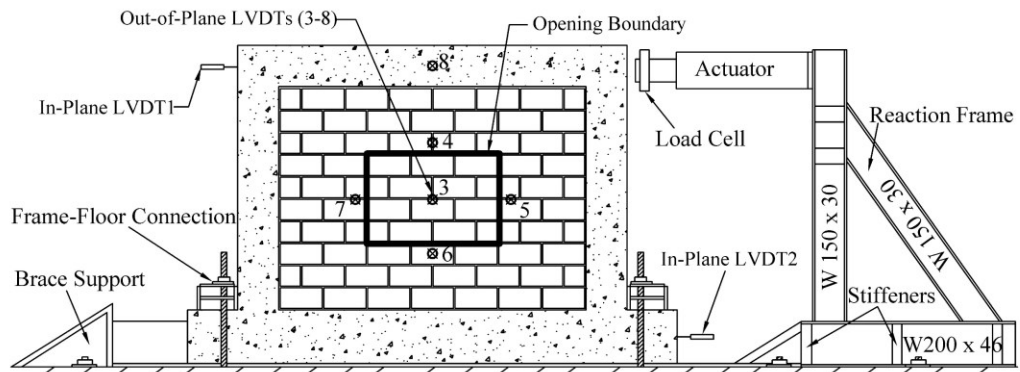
Schematic test set-up for in-plane loading of specimens IF-D1 and IF-D2
